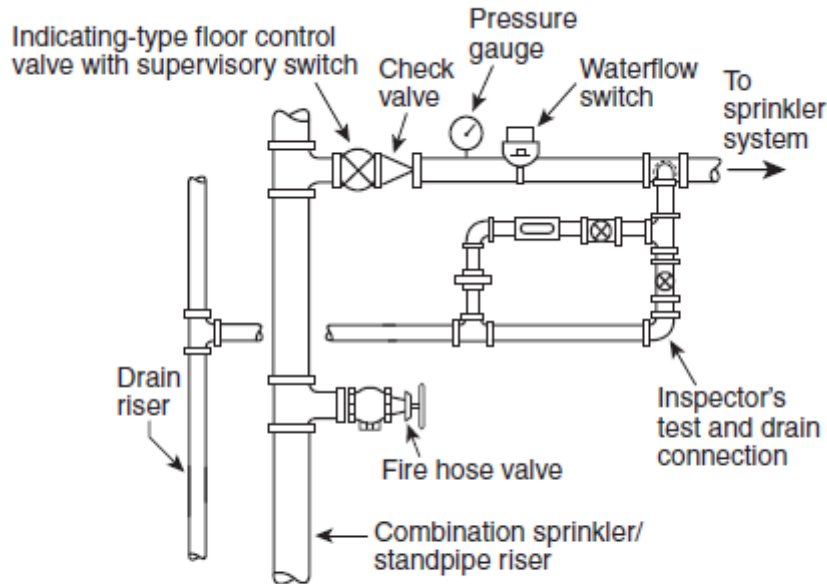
(a) Acceptable Piping Arrangement for Combined Sprinkler/Standpipe System.
